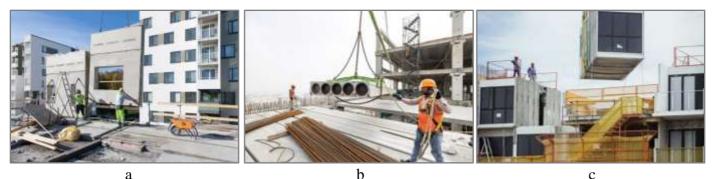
Precast concrete systems (a) Frame system, (b) Panel system, (c) Cell system (URL-1) (URL-2)
